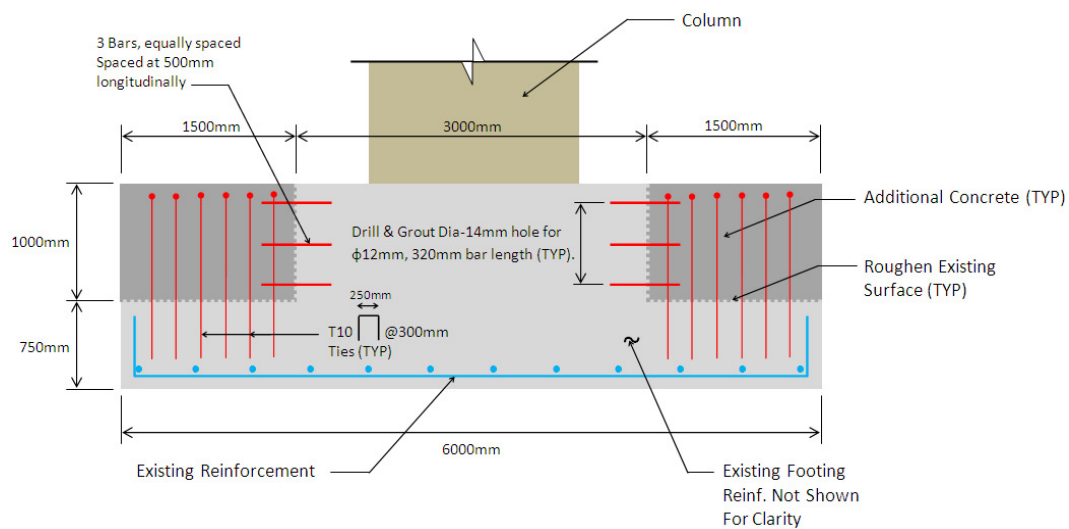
Proposed retrofit scheme for the footings in pier #2, pier #3, pier #6, & pier #7.
